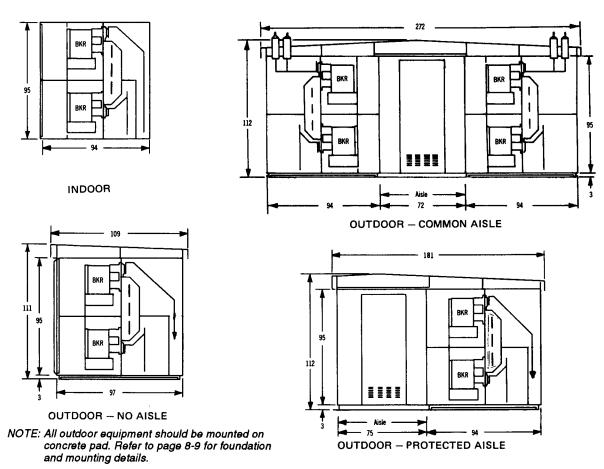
Typical Section Dimensions—Indoor and Outdoor Equipment (All dimensions in inches)
